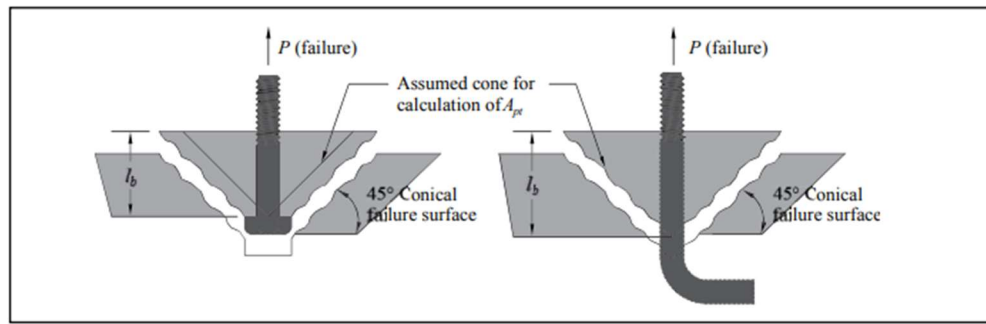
Anchor bolt tensile break out cone [TMS 402/602-16]
